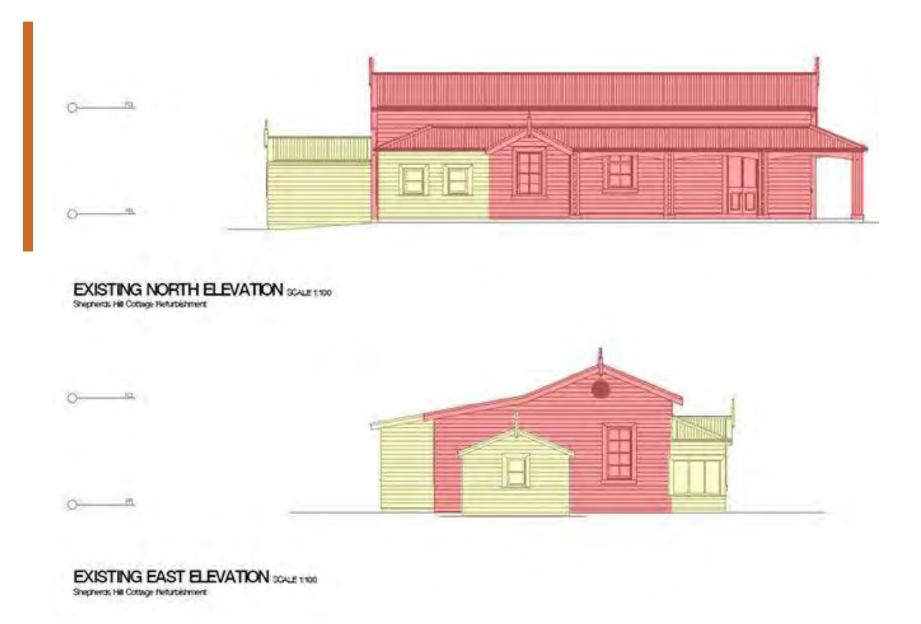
Significance ranking for the northern and eastern elevations of the cottage. (Source: Curran, existing north and east elevations, A400, revision A, 2 June 2017)
